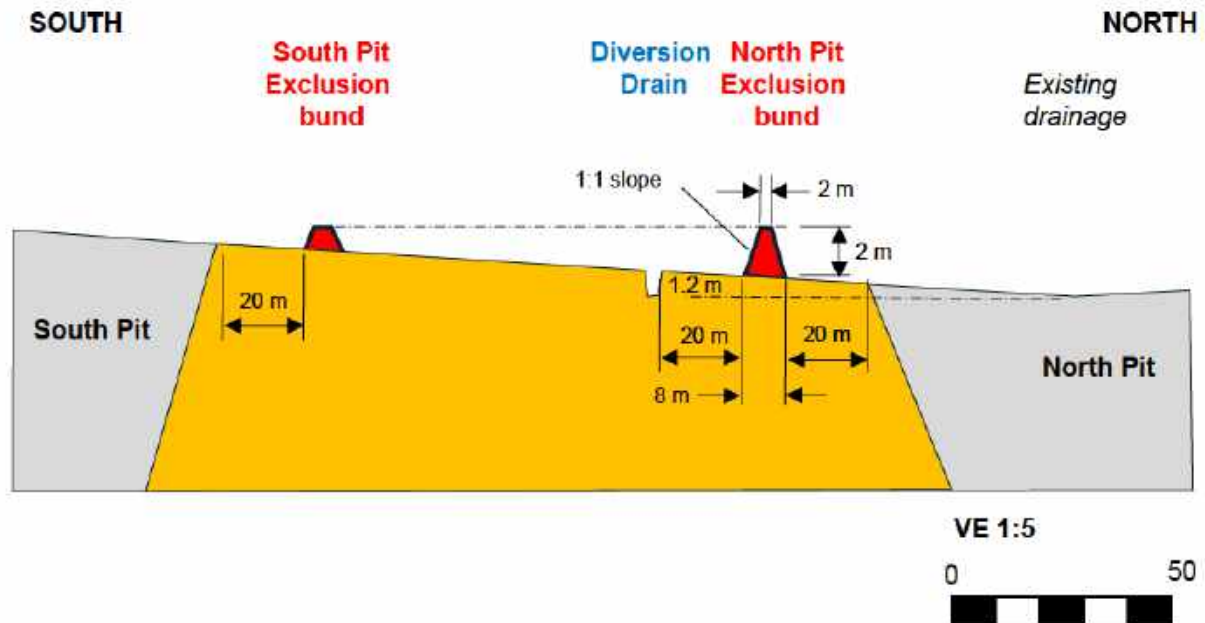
Cross section through proposed stormwater infrastructure (looking west).
